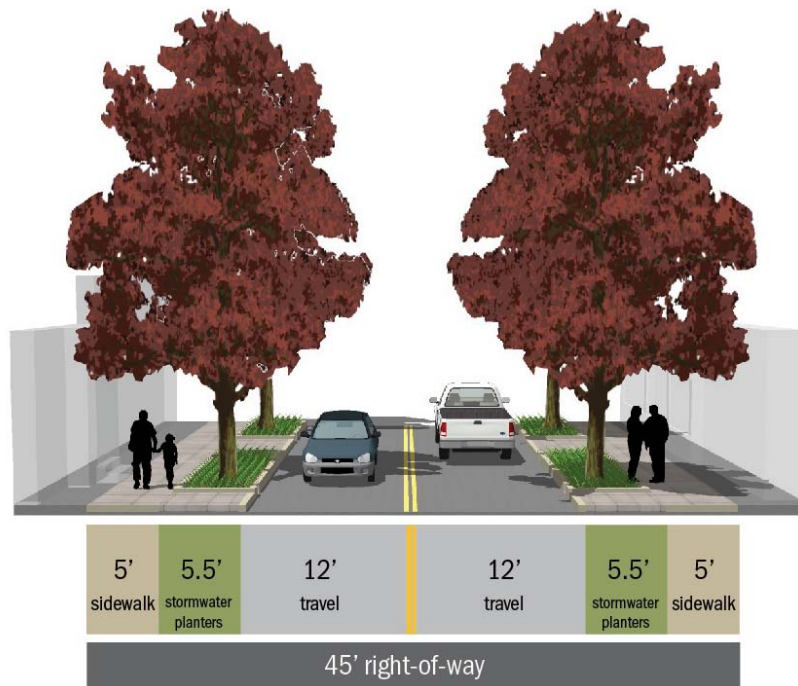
Conceptual Cross-Section for Ochoco Street – East of Main Street within existing right-of-way (looking east)
